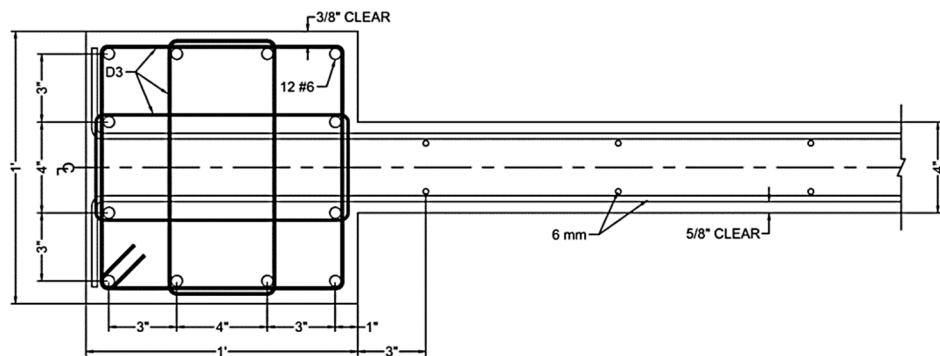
Shear Wall Specimen B2 – Cross Section (Oesterle et al. 1976)
